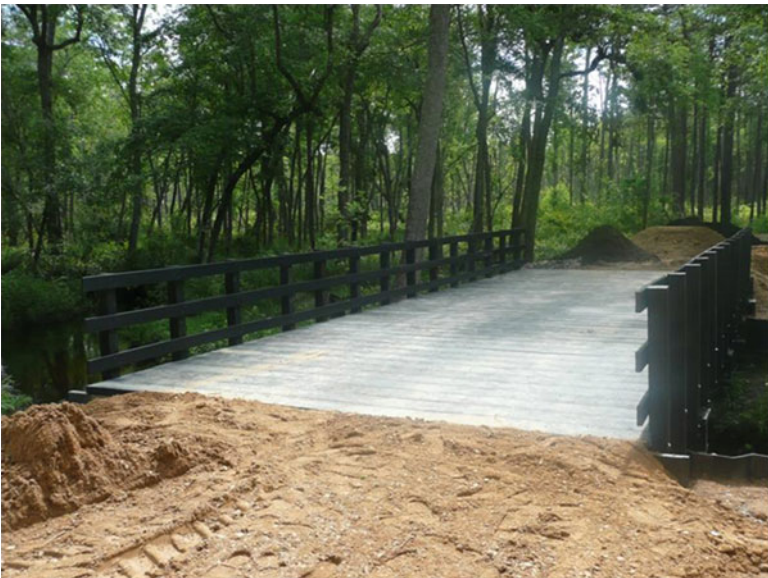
T85-18 showing deck boards spanning the width of the bridge and the railing system
